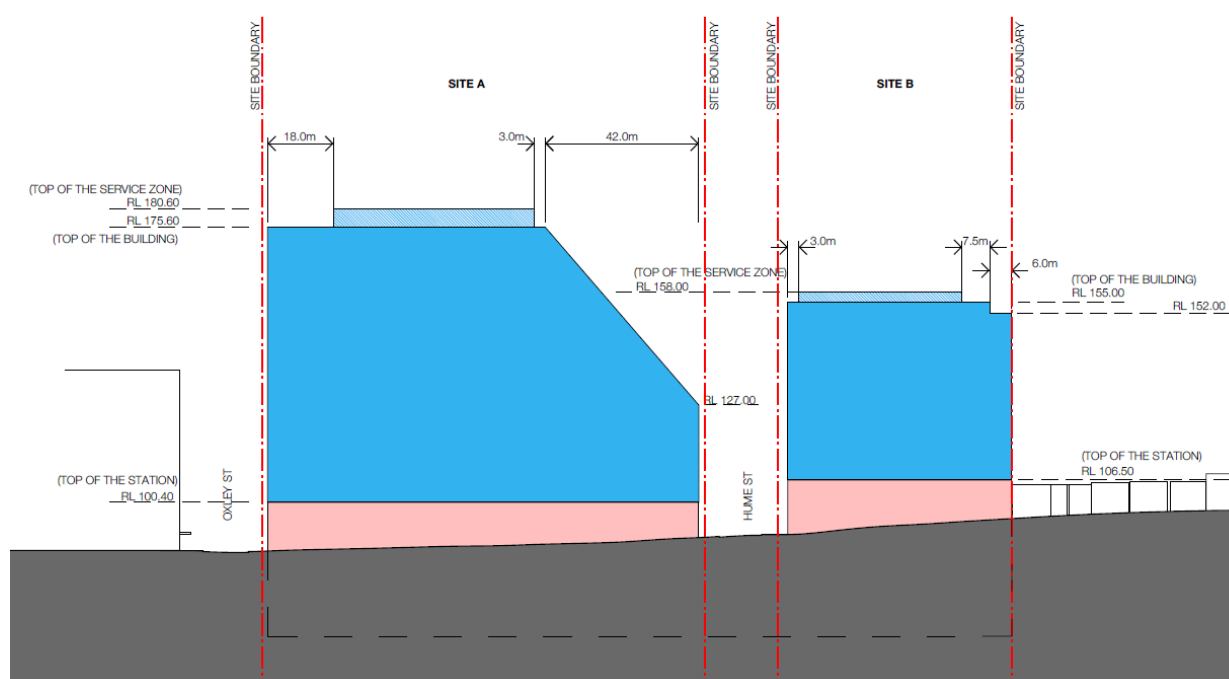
West elevation of the building envelope under the Amended Scheme, showing CSSI Approval (pink) and OSD components (blue)
